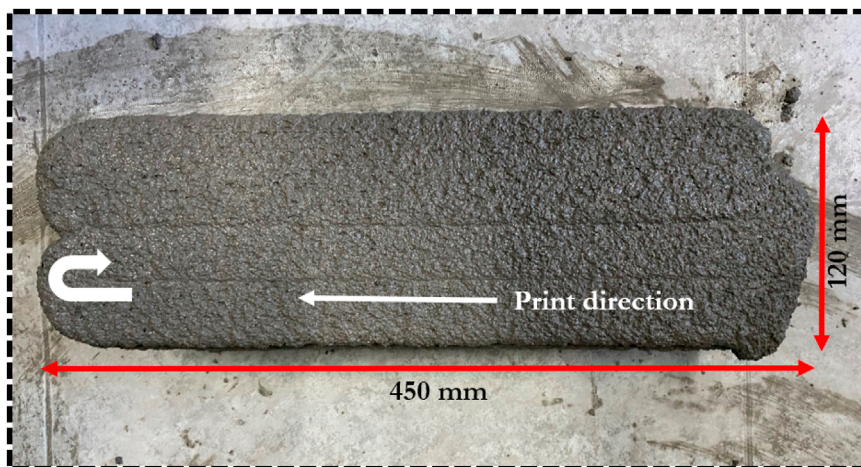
3D-printed fiber reinforced UHPC specimen.
